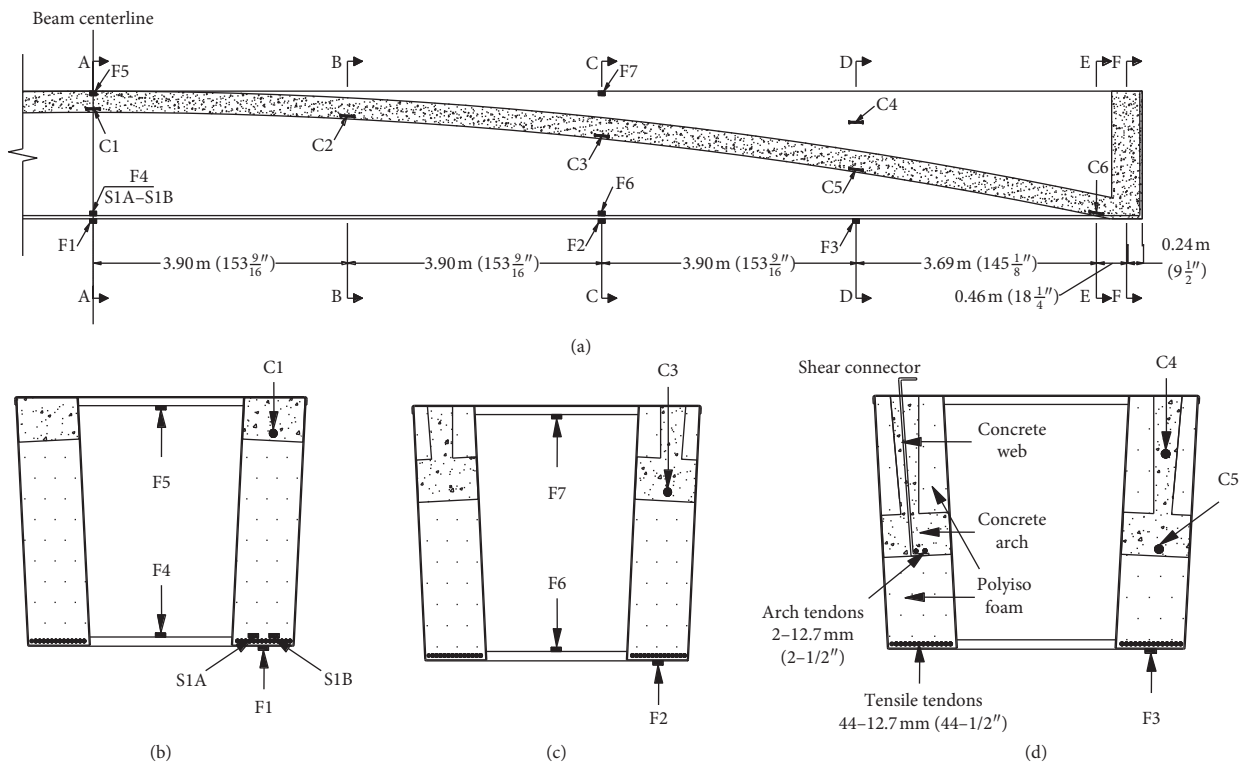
HCB2 instrumentation. (a) HCB2 elevation. (b) Section A-A. (c) Section C-C. (d) Section D-D.
